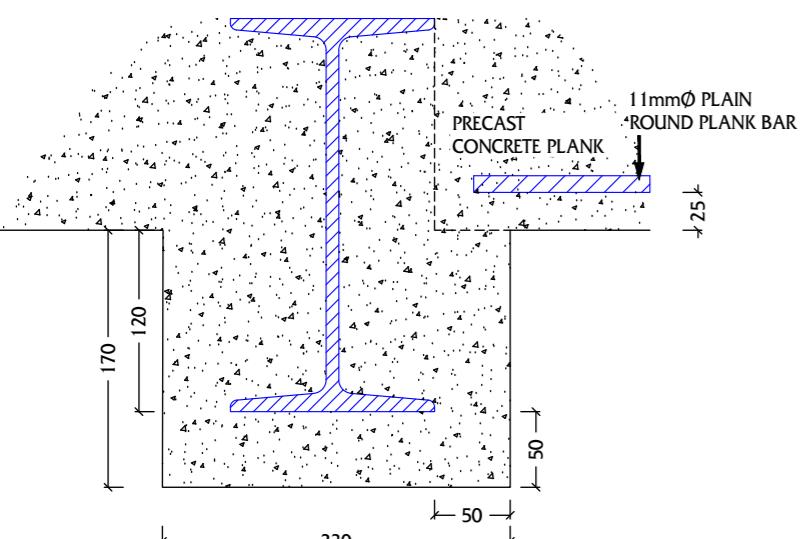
PART SECTION LOOKING WEST THROUGH 1ST FLOOR PRIMARY BEAM - SURVEY AREA F/10-11 SCALE 1:5
